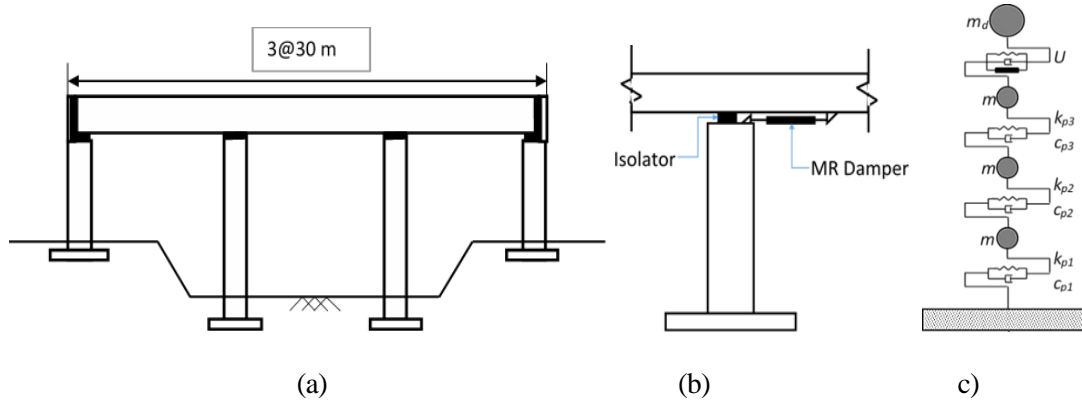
(a). Three-span bridge deck-pier system, (b). Simple structural model for deck-pier system attached with control devices and (c). Equivalent mechanical model
